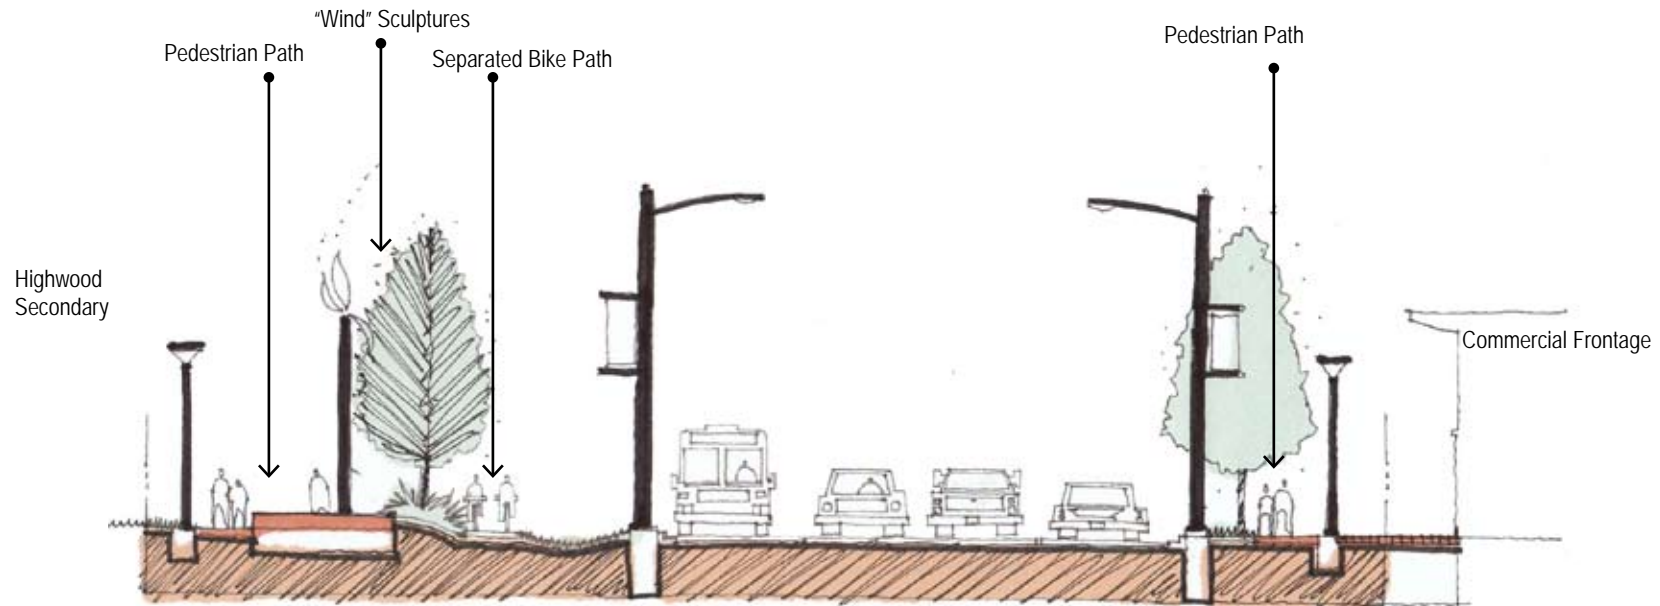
Cross Section B: 12th Avenue illustrating "Who Has Seen The Wind Trail"
